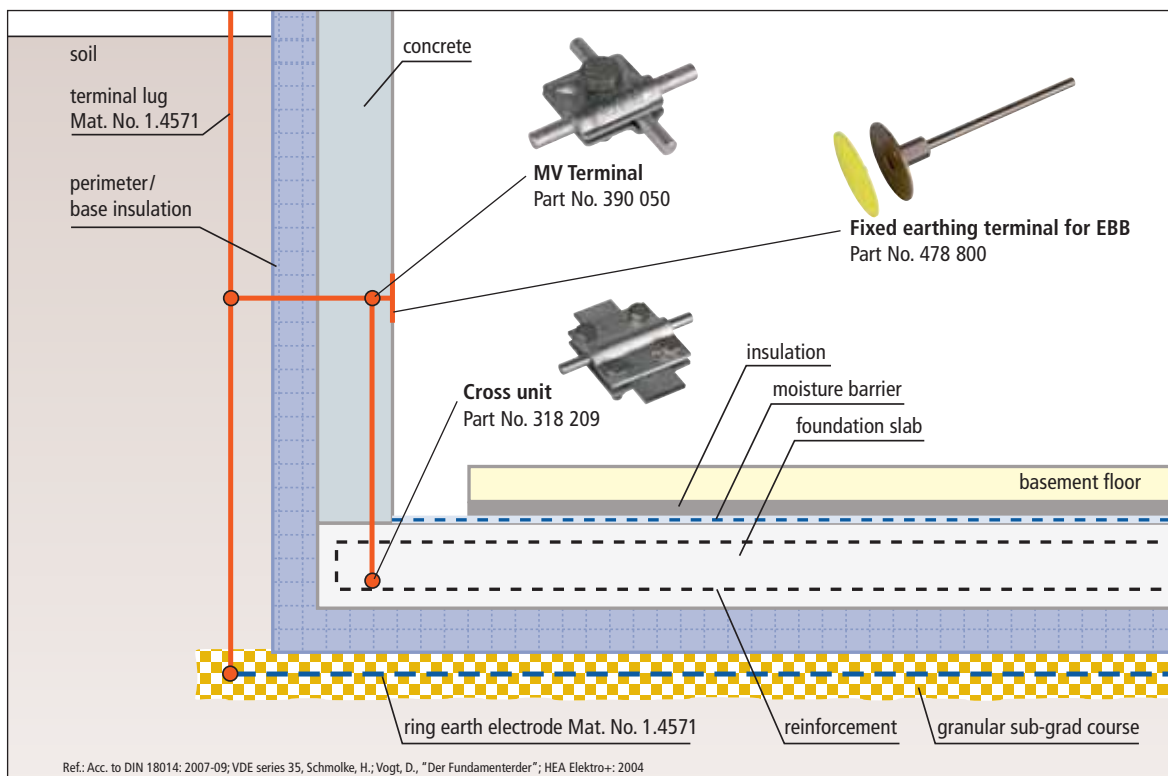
Arrangement of a foundation earth electrode in case of a closed floor slab (fully insulated)
